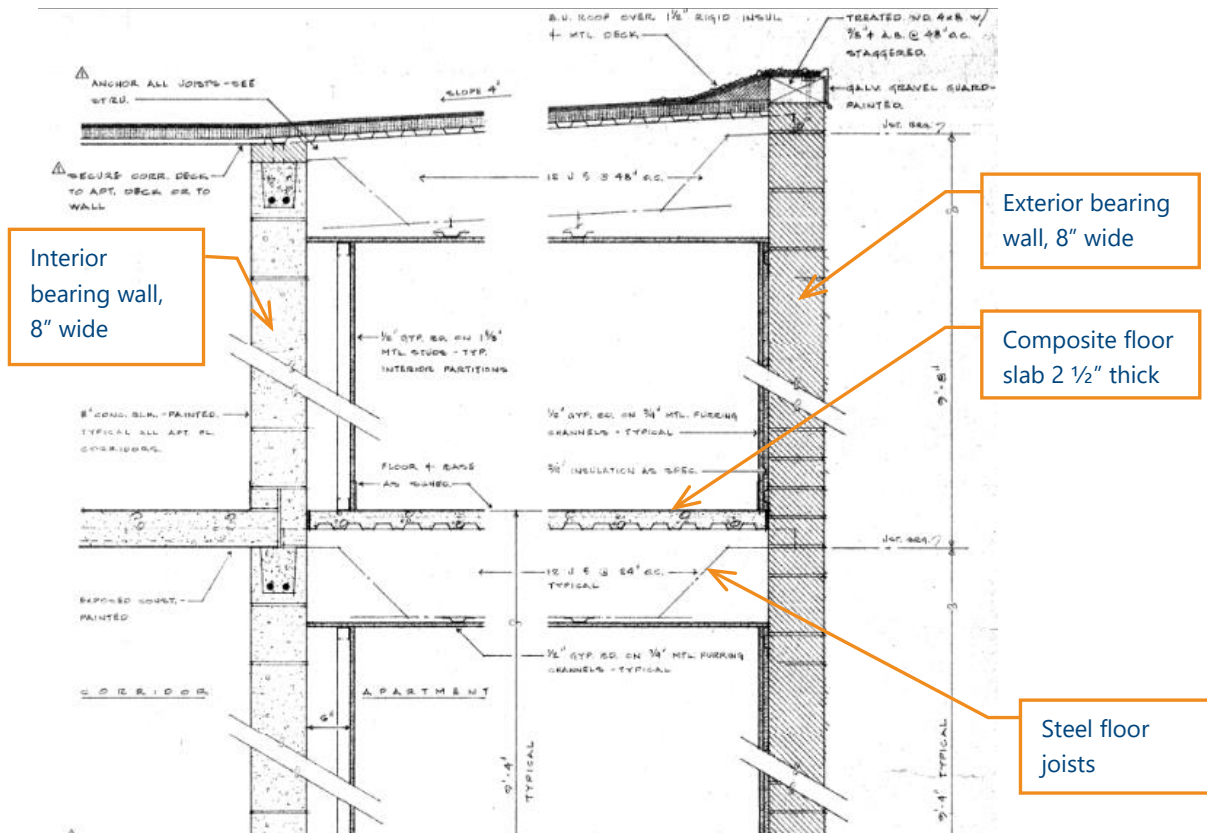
Section (north-south direction) through the exterior and interior bearing walls
